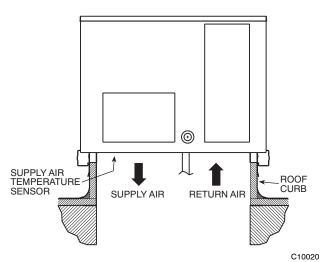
Typical Mounting Location for Supply Air Temperature (SAT) Sensor on Small Rooftop Units
